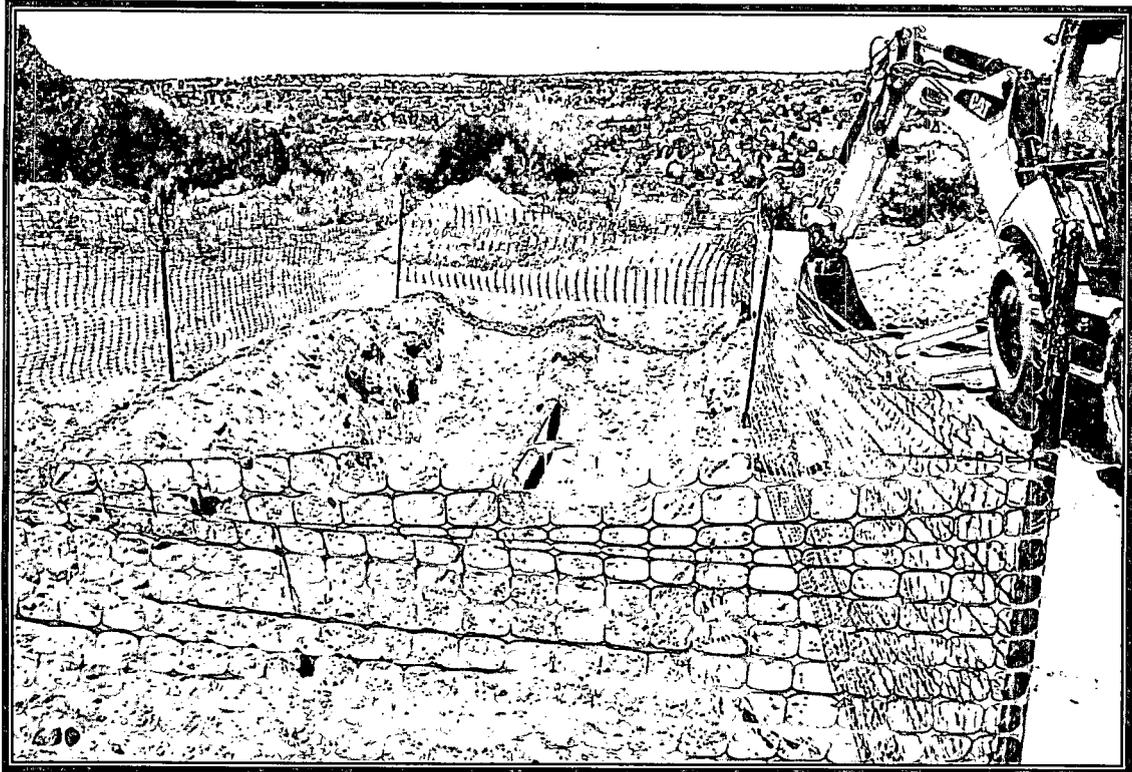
Excavation and stockpiled soil at the McKenzie #2 Well Tie Release site
